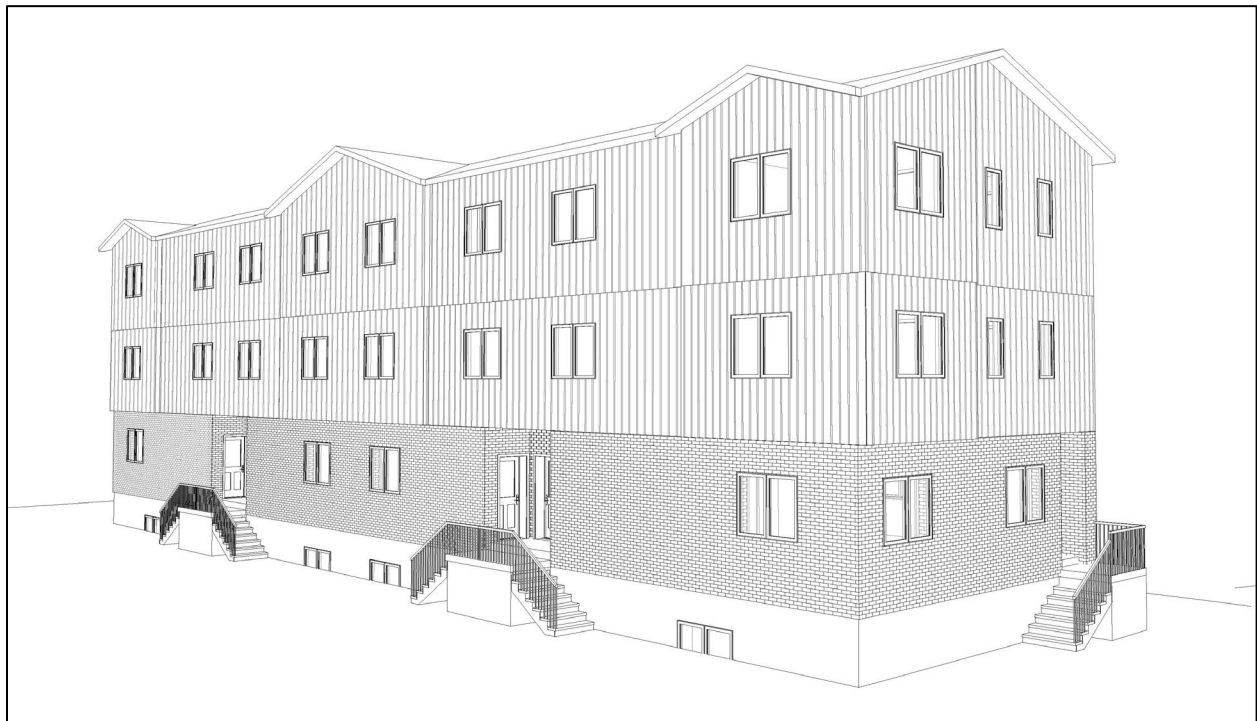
Proposed stacked townhouse visualizations (looking southeast)
